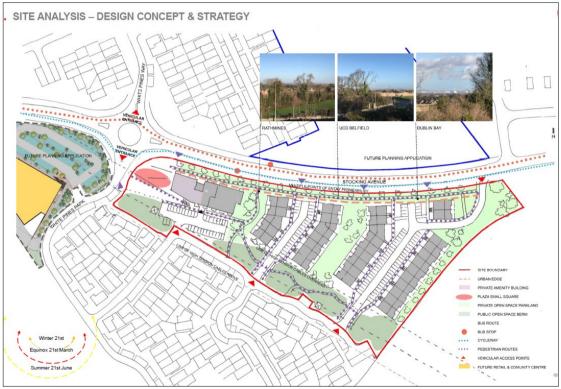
Ardstone Homes Planning Application Sites: Landscape Masterplan, Alternative Layout 3 (Option B) [Source: RAU 2020]
